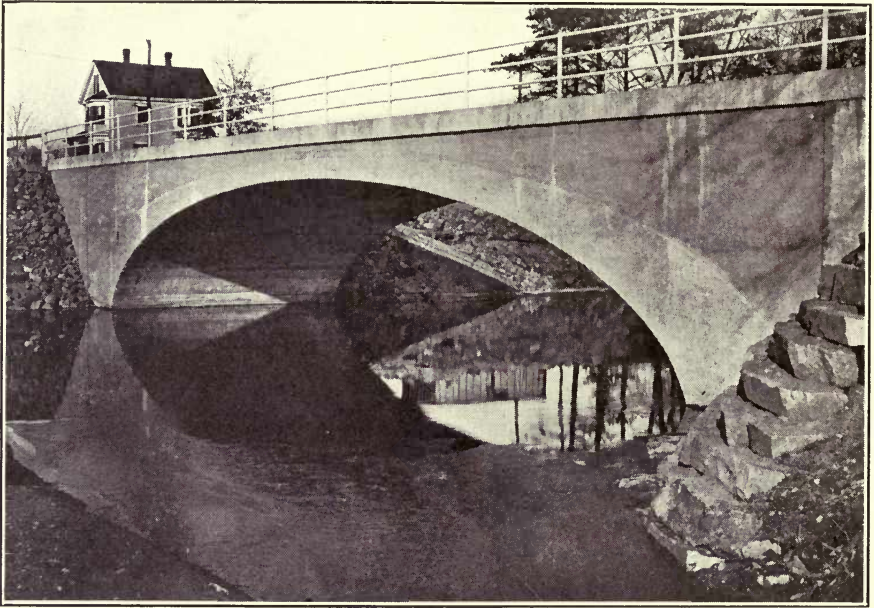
ARCH BRIDGE WITH SPAN OF 75 FEET, ELM STREET, CONCORD, MASS.
